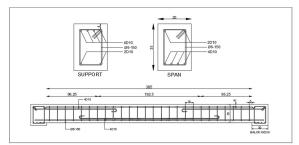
Cross-Section and Longitudinal Section Details of the Secondary Beam
